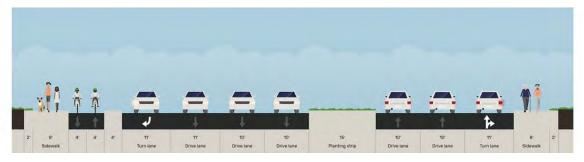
MDOT SHA's Proposed Section on Georgia Avenue
